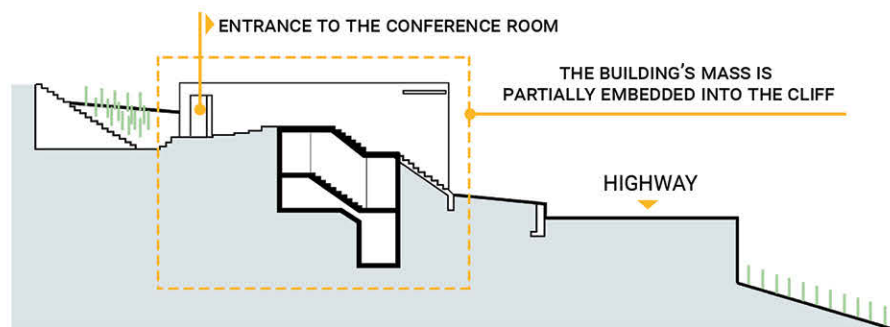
CROSS-SECTION OF THE BUILDING, REFLECTING THE CONNECTION WITH THE TERRAIN
